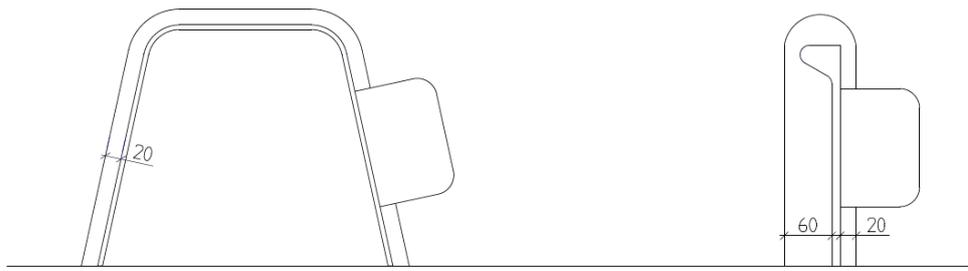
Welded-on plate pieces for stabilising stiffeners at transverse trusses
